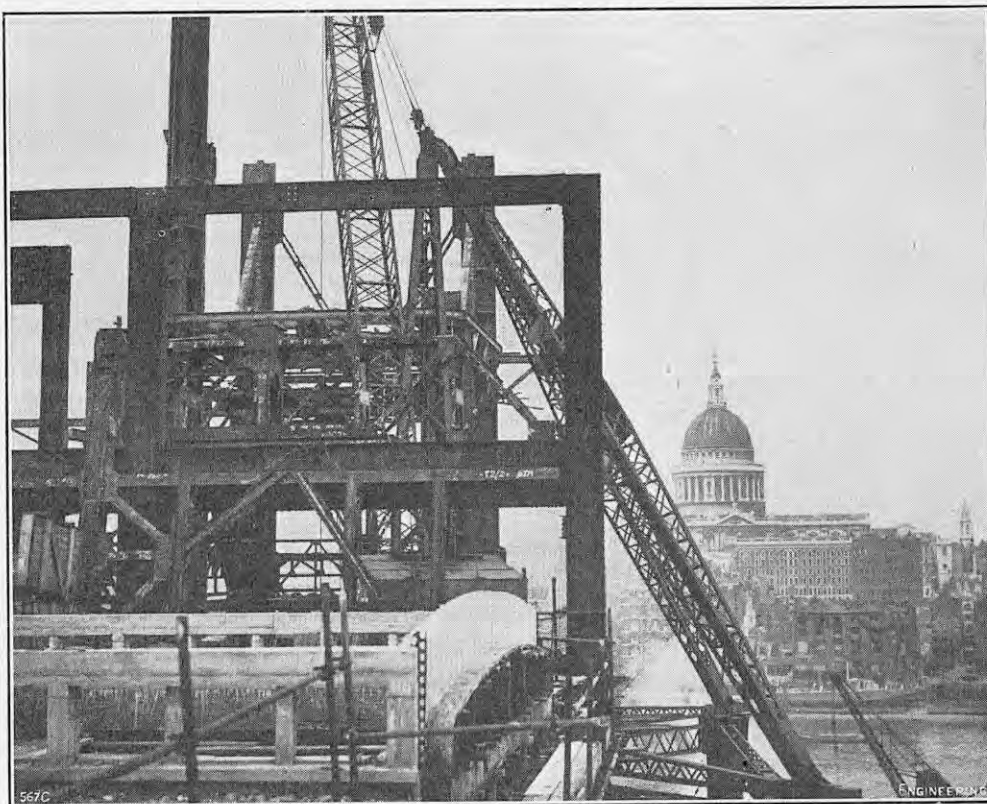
GIRDERS FOR 320-FT. STACK IN POSITION.
